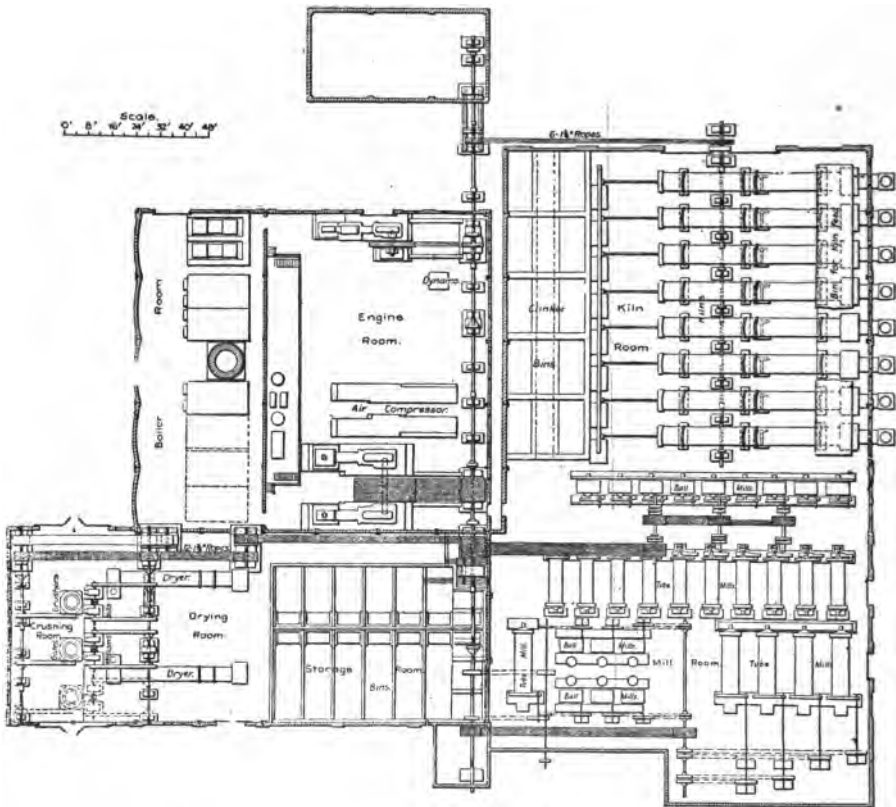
GENERAL PLAN OF MILL BUILDINGS OF SIEGFRIED CEMENT PLANT.
